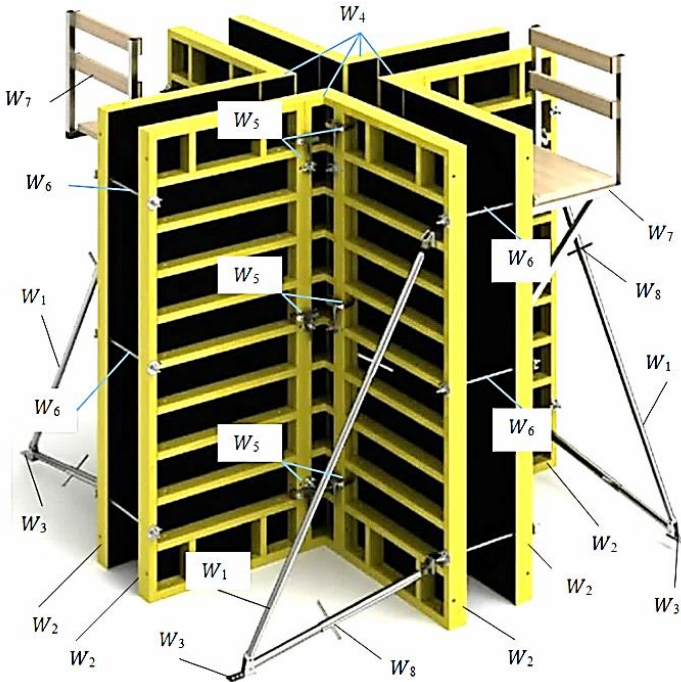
A complex of actions to assembly panel formwork of the wall structure
